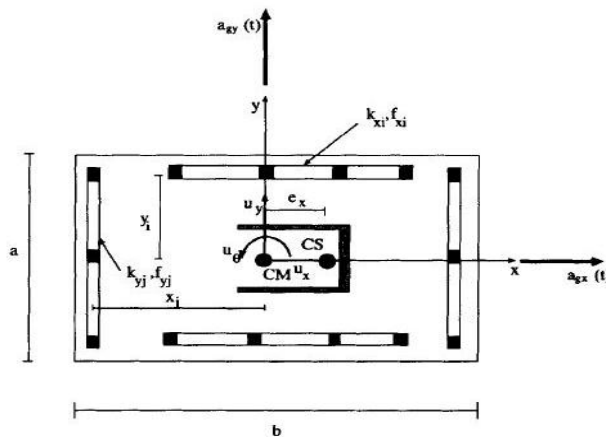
Typical plan of buildings considered (asymmetric-plan buildings) [3]
